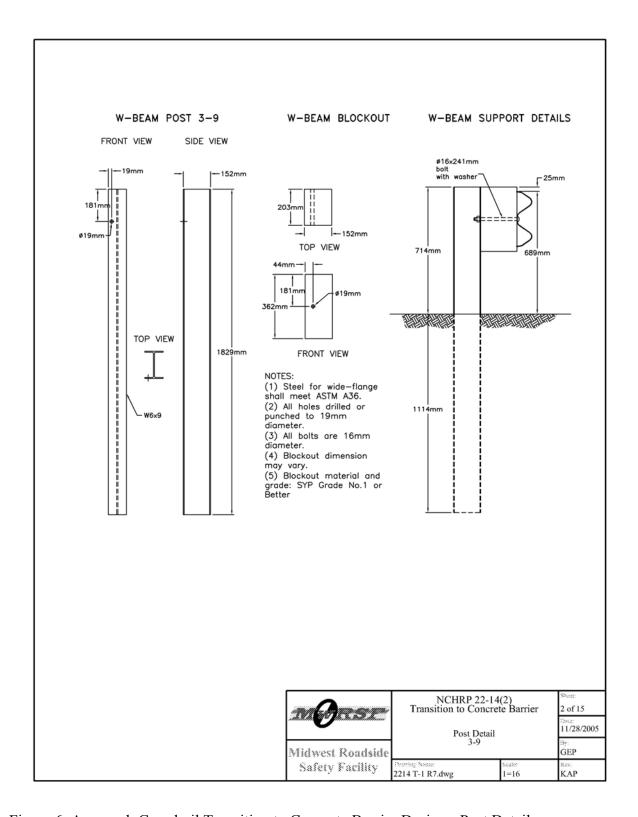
Approach Guardrail Transition to Concrete Barrier Design - Post Details
